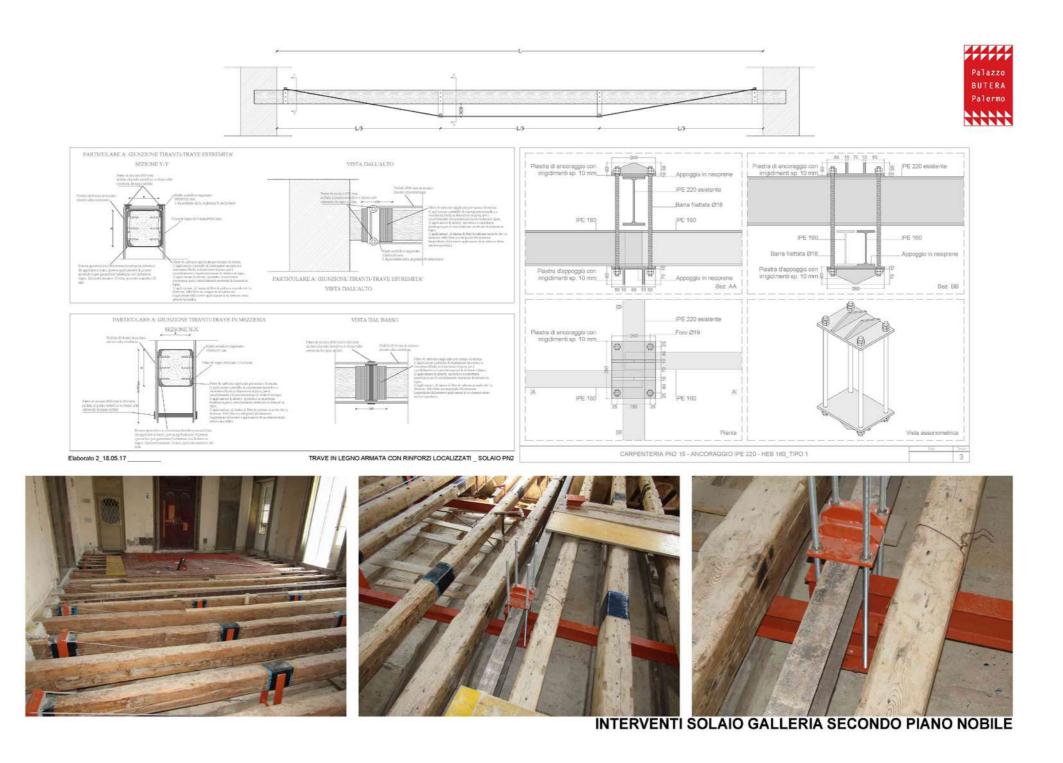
Intervention of structural consolidation on wooden floor. © Project Designers
